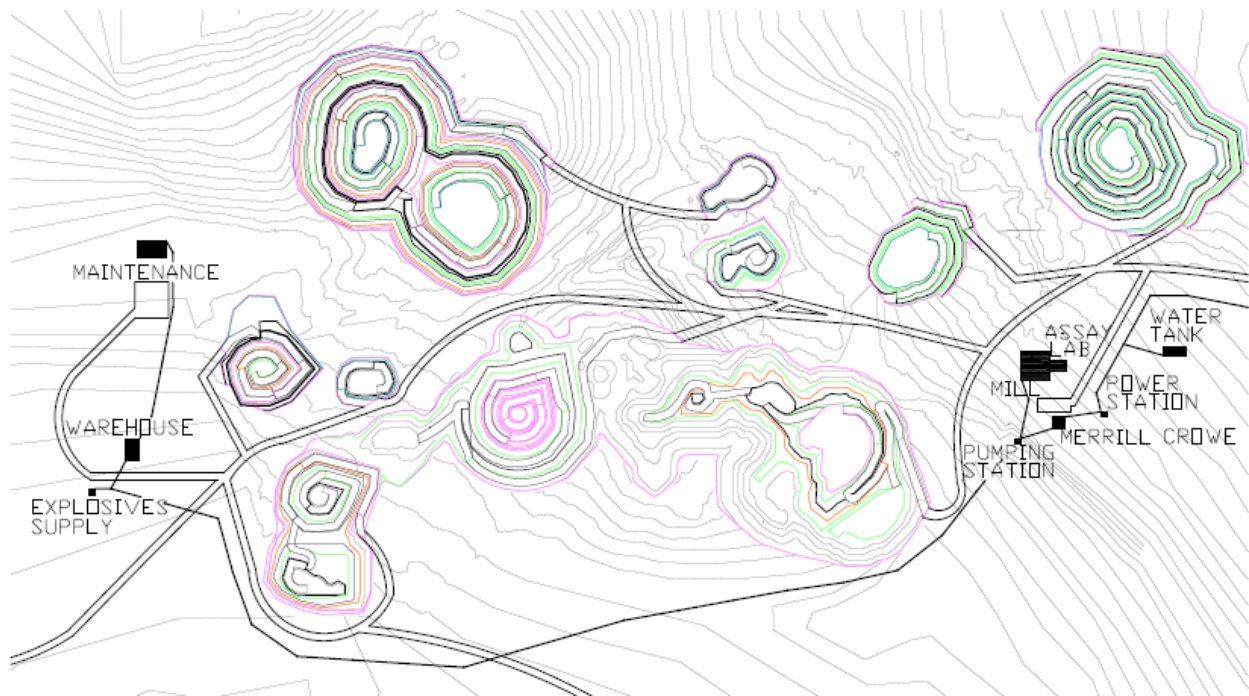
Overview of the waste dump and tailings management facility
